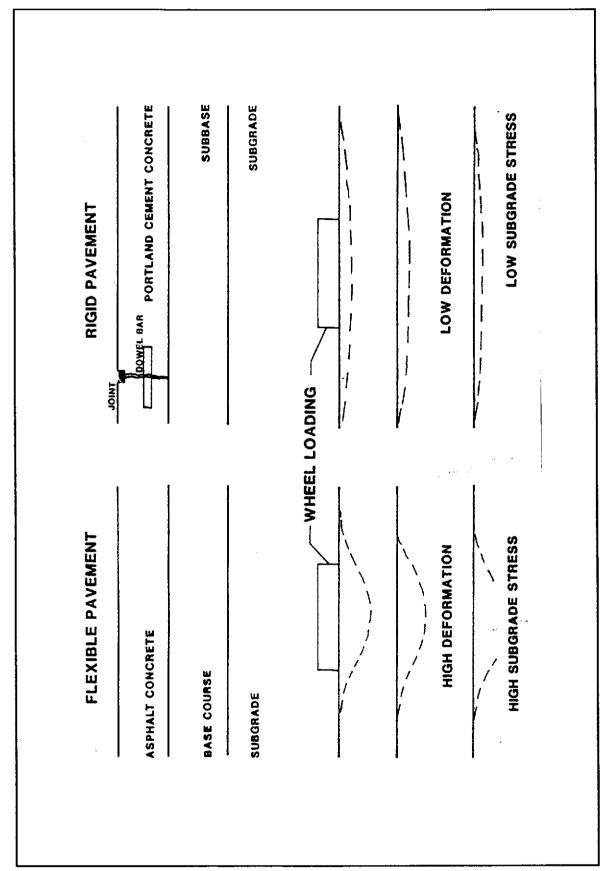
Typical Flexible and Rigid Pavement Deflection Basins.
